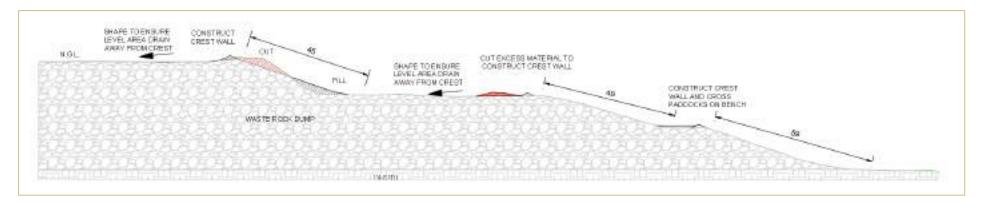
WRD: Typical Sections showing existing and reshaped slopes
